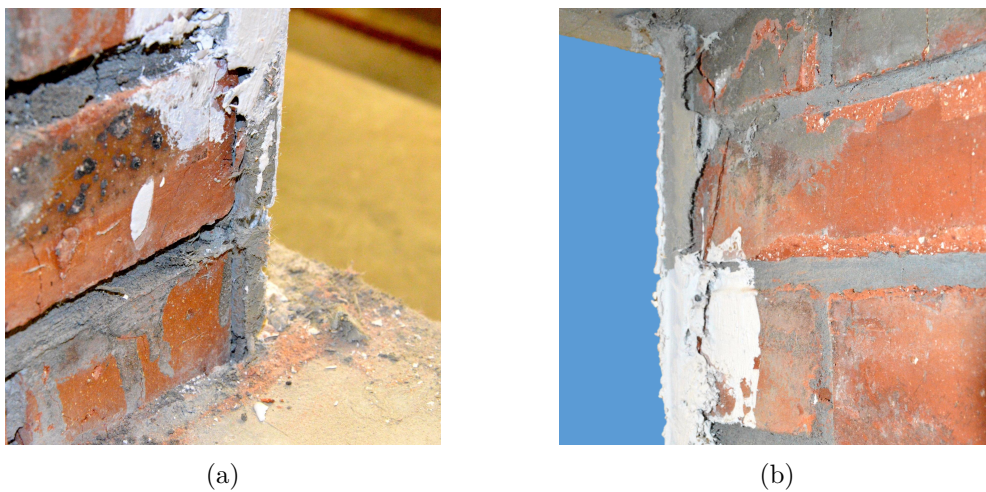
SW-220-15-3 (a) Bottom corner debond ; (b) Top corner debond.
